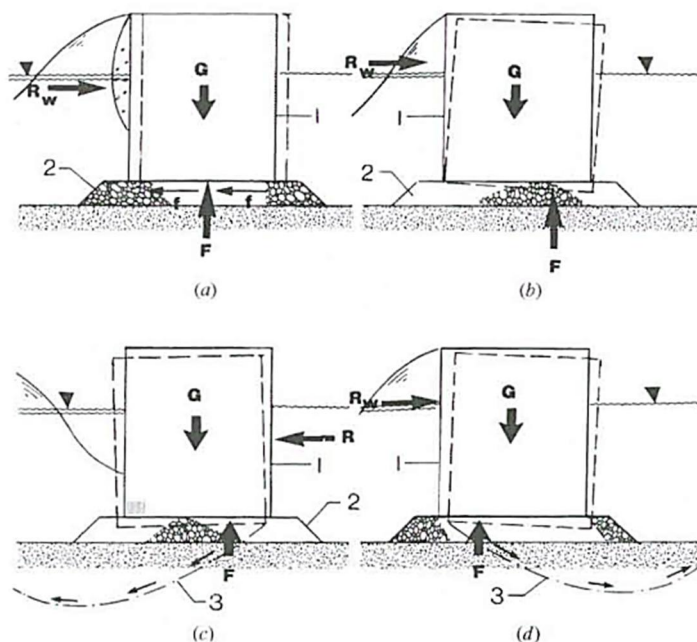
Overall failure modes of vertical breakwater: (a) sliding; (b) overturning; (c) and (d) settlement due to foundation failure. 1, Upright section; 2, rubble foundation (mattress); 3, slip surface.
